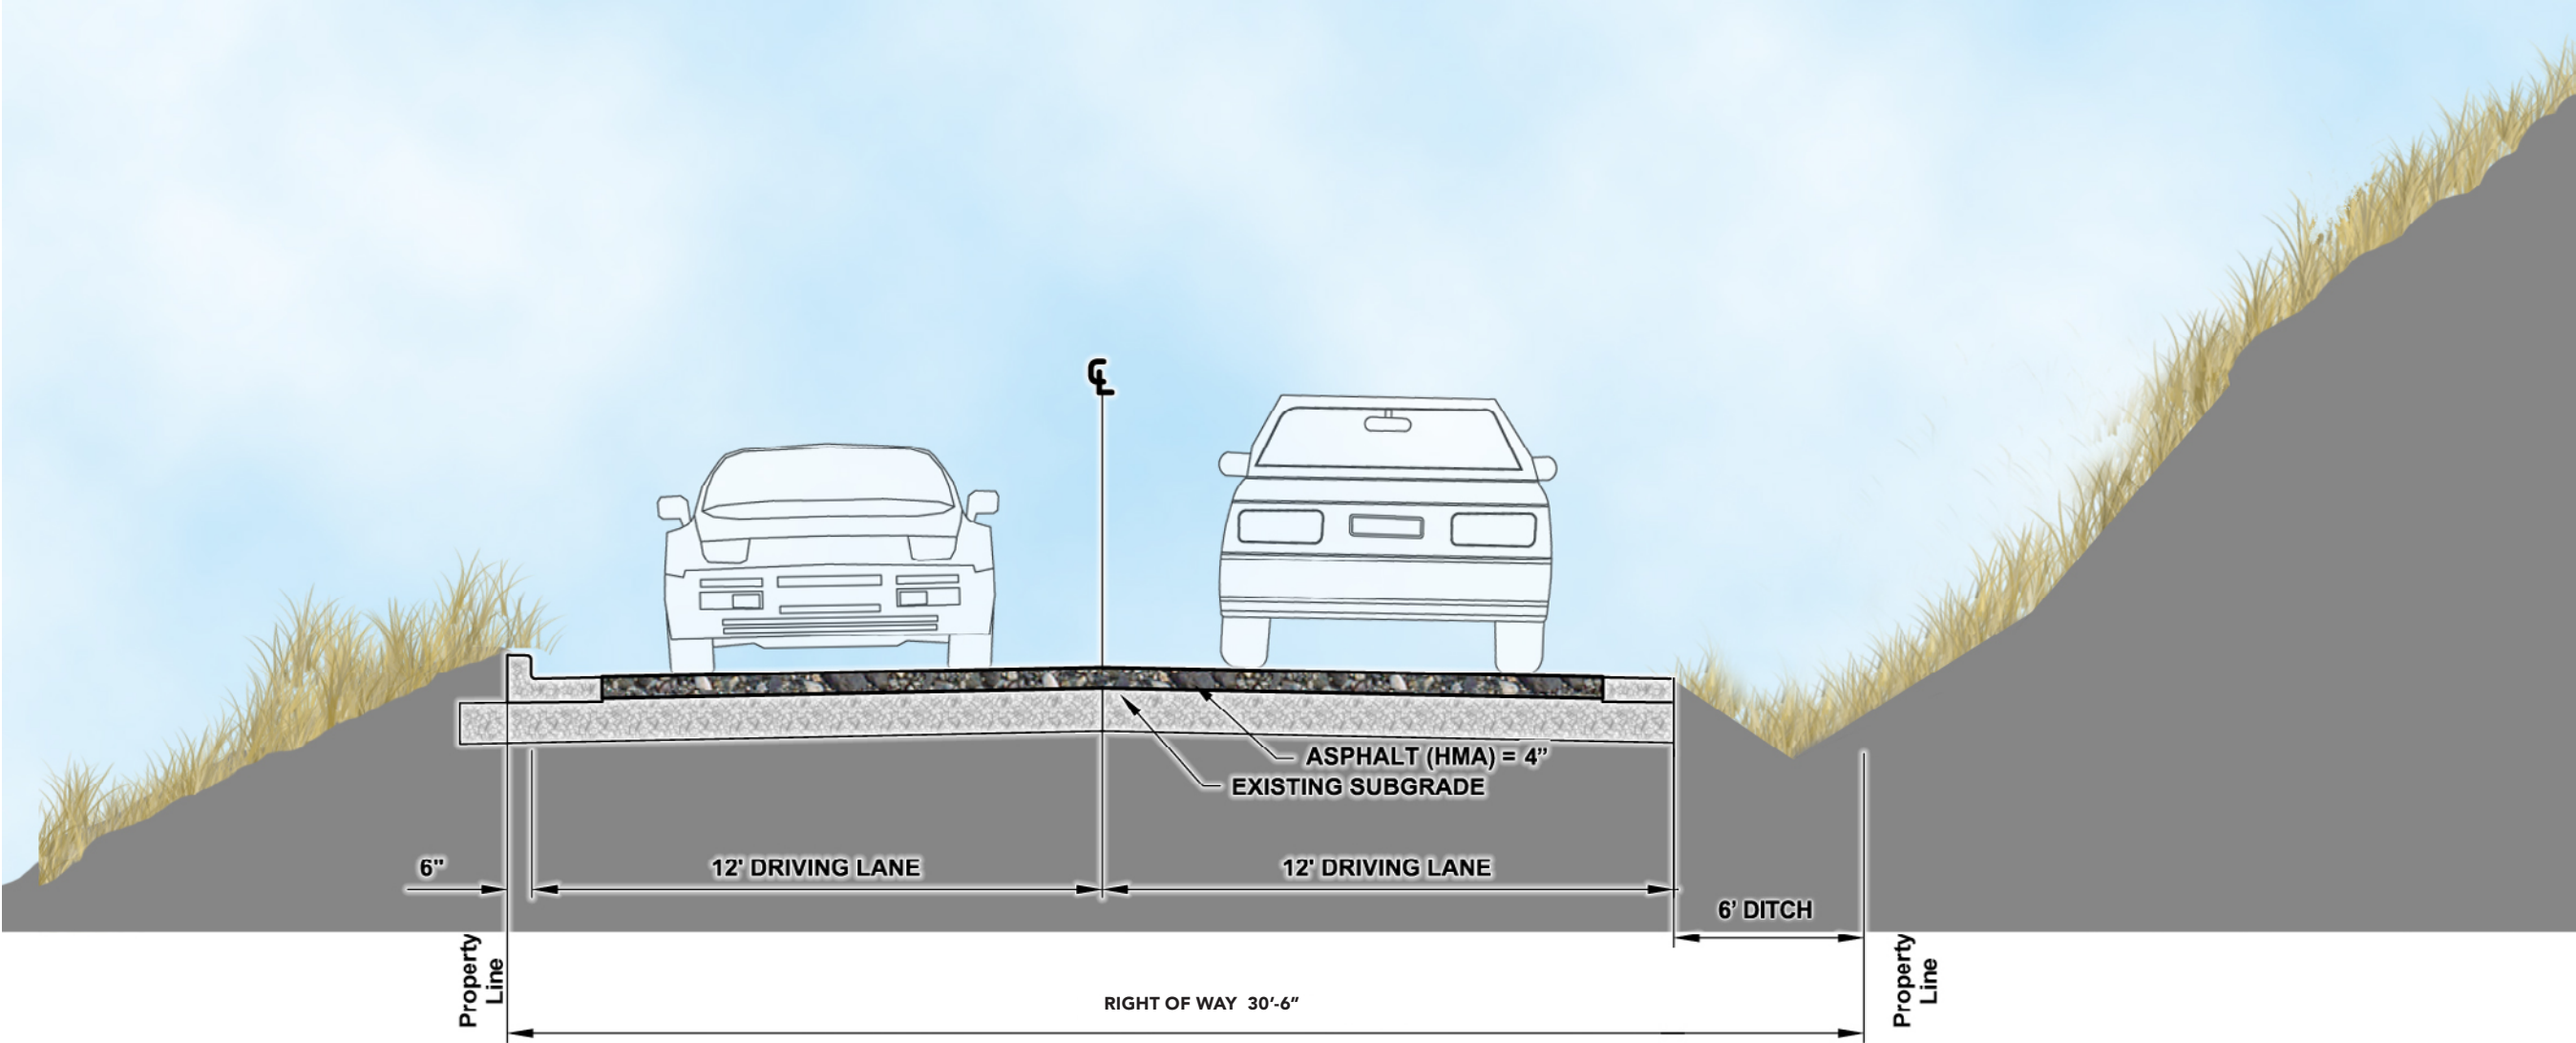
EXHIBIT K: ROADWAY SECTION - LA POSTA ROAD (FULL IMPROVEMENT)
